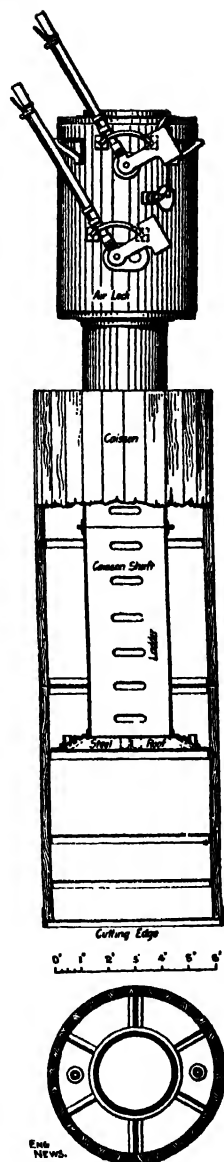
Wooden Staff Caisson with Detachable Roof and Shaft.
